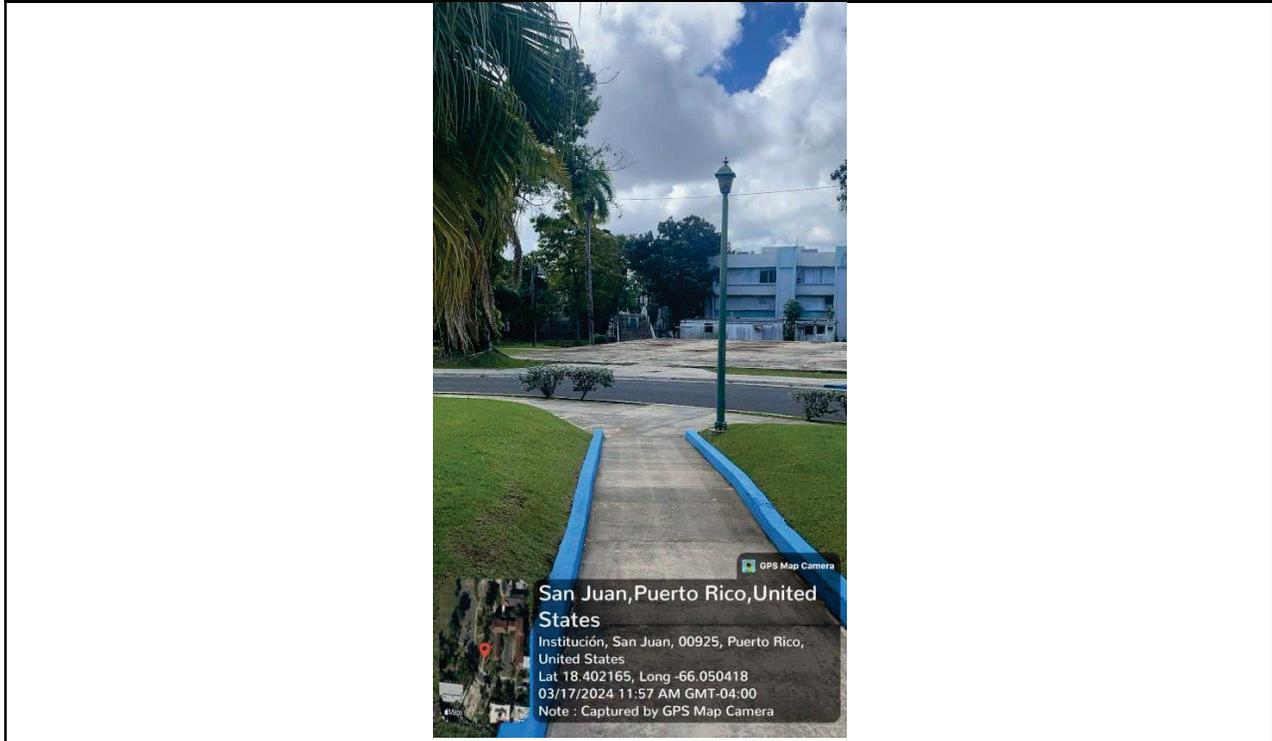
Northwest side view of Henry Klumb bridge; taken from UPR Rio Piedras Campus, looking southeast.
